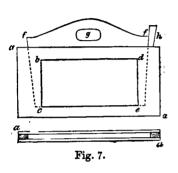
, however, illustrates a wooden stop made of "two boards $(a \ a)$ joined together, but kept separate by pieces at the end into which the sluice board (ff) is passed, being lifted up by the hand-hole (g), and kept apart at any point by the wedge (h). The aperture
